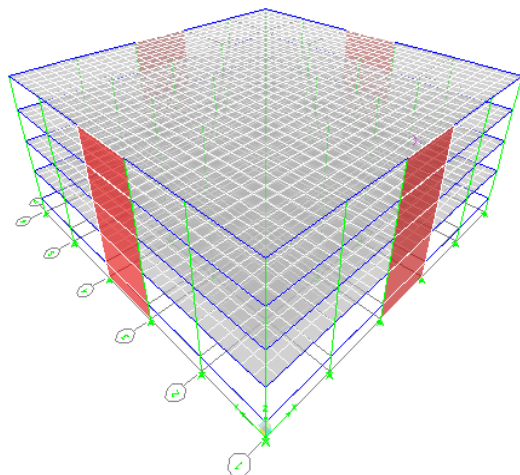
Shear wall positioned at mid section of perimeter beams of building
